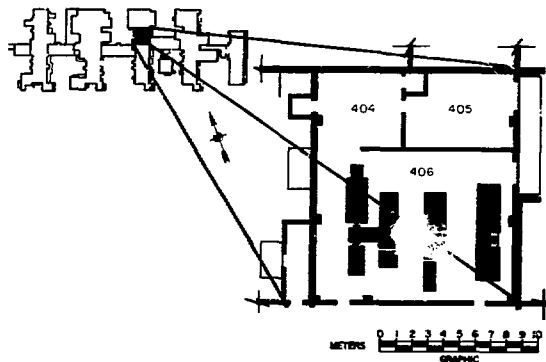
Floor plan of room 406 and adjoining support rooms.
